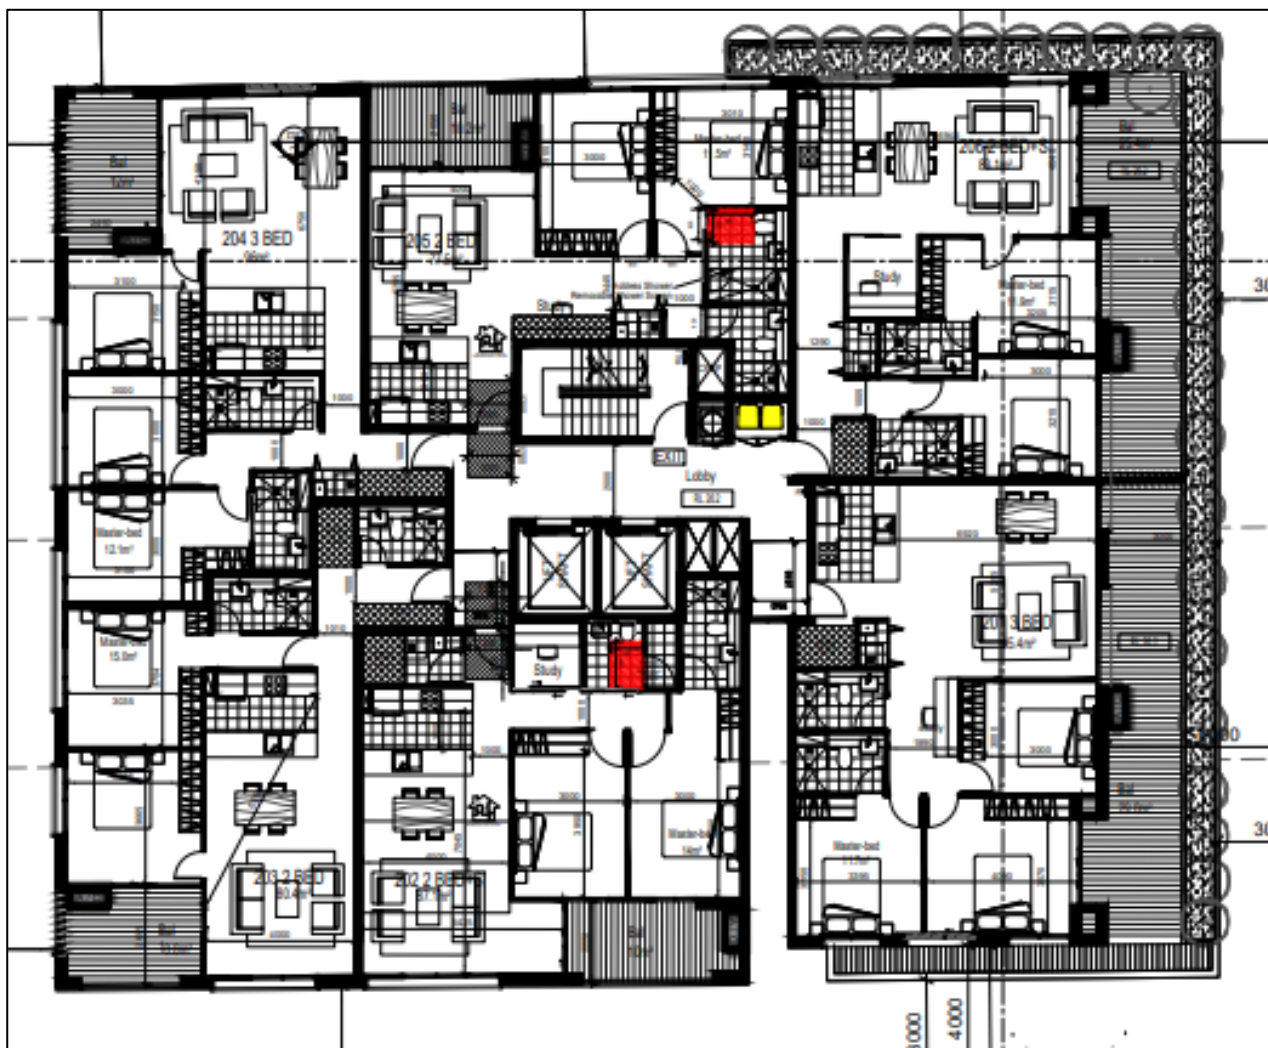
Extract of applicants submitted Level 2 Floor Plan.
